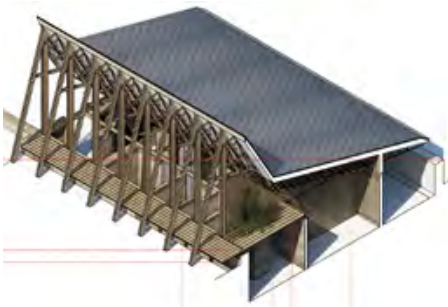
Design of Training Building Sponsored by NTR Foundation
